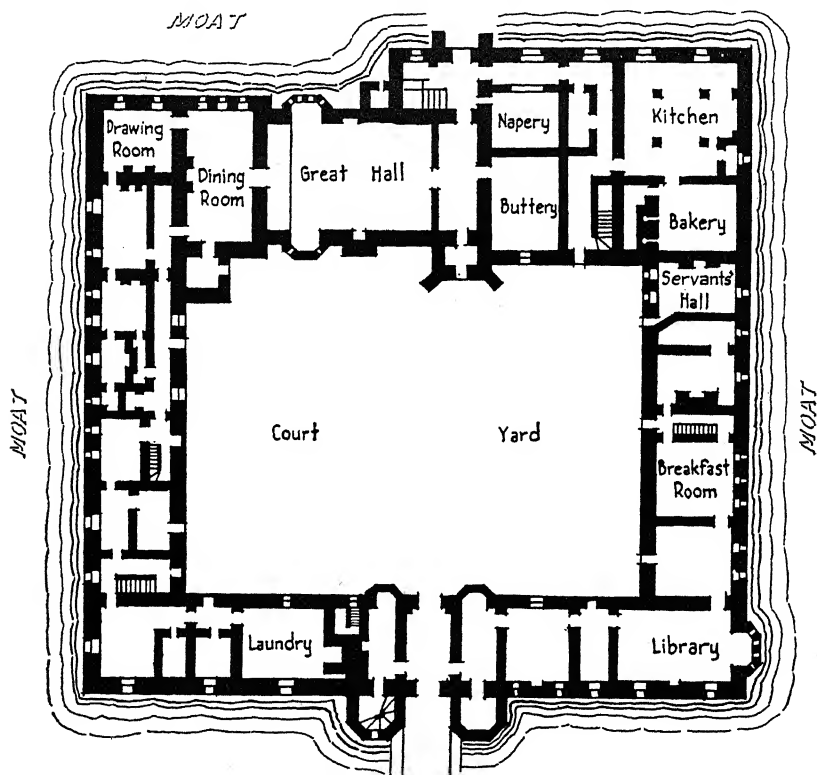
PLAN, OXBURGH HALL, NORFOLK (1482)
